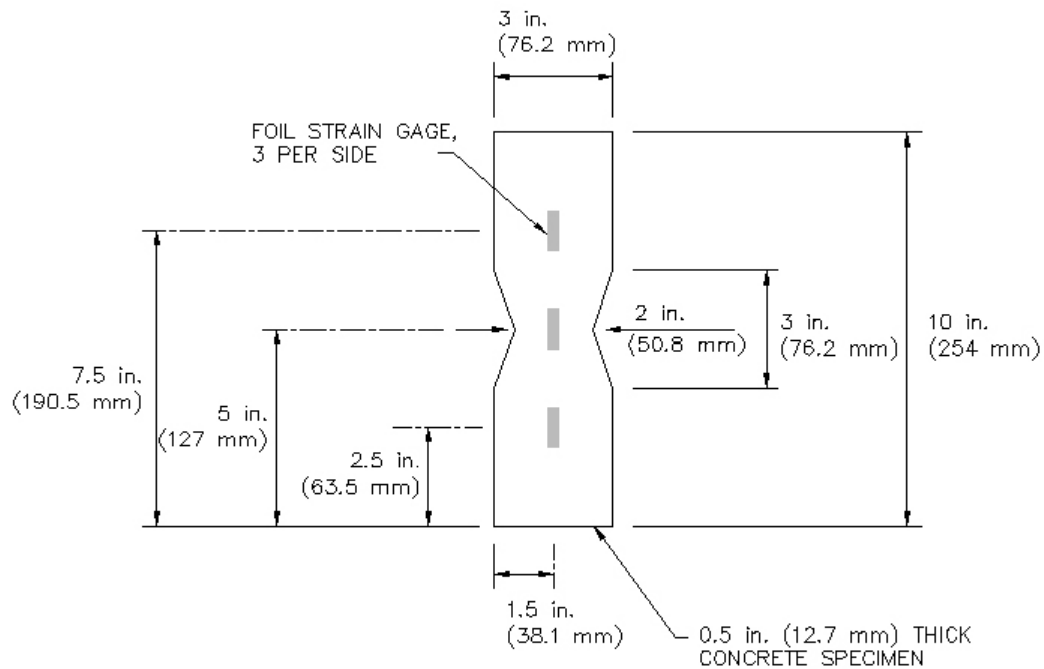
Direct tension specimen, dimensions and strain gage layout.
